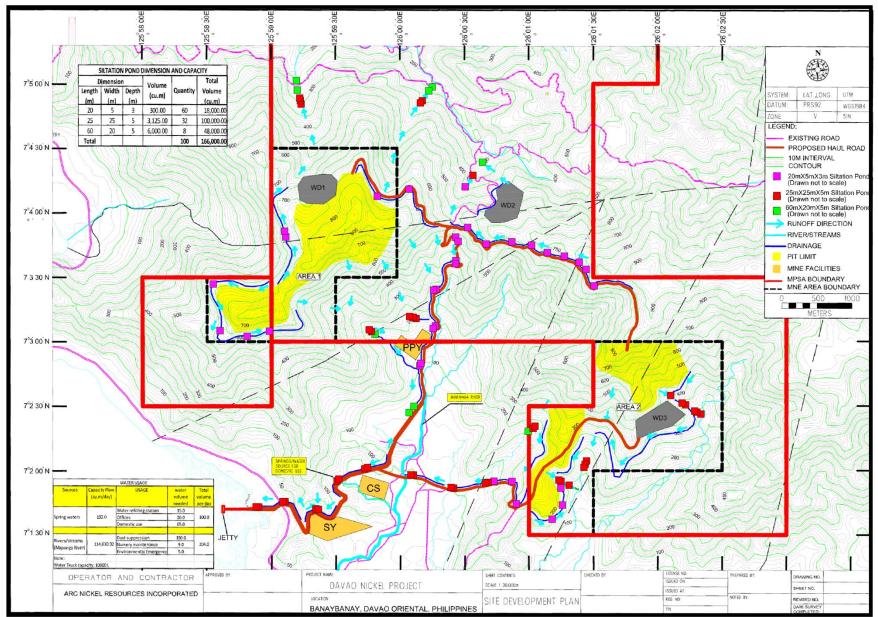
Site Development Plan showing the Location of Water Sources and Siltation Ponds (Source: RCMC)
